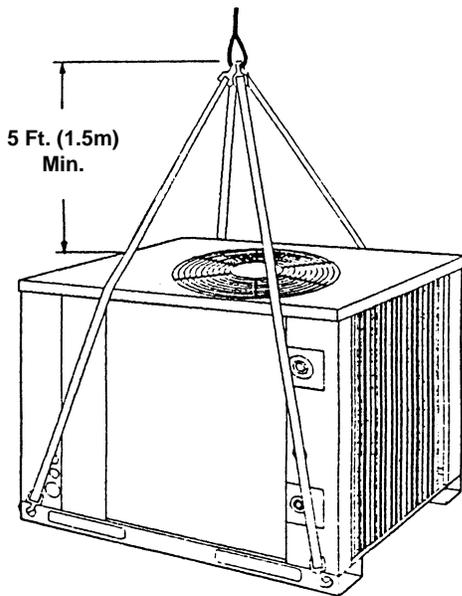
TYPICAL RIGGING (090 MBH Unit Show)
